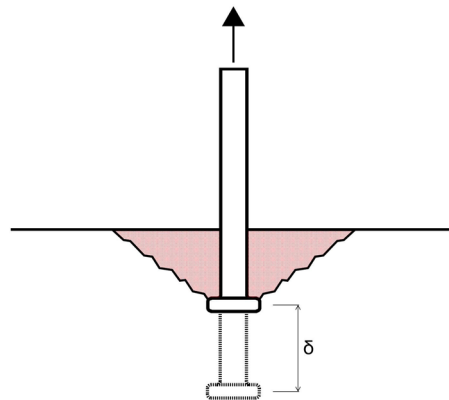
Concrete breakout failure of a headed anchor preceded by pullout failure, where δ is the displacement of the anchor due to the crushing of concrete above the anchor head (adapted from Eligehausen et al. (2006))
